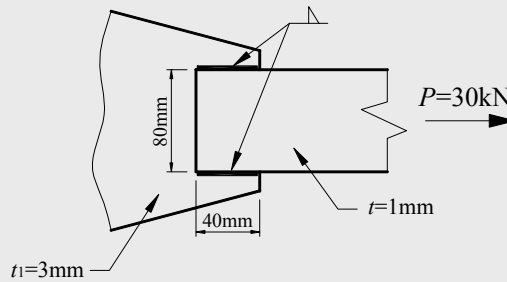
Lap side welded strap-to-gusset
